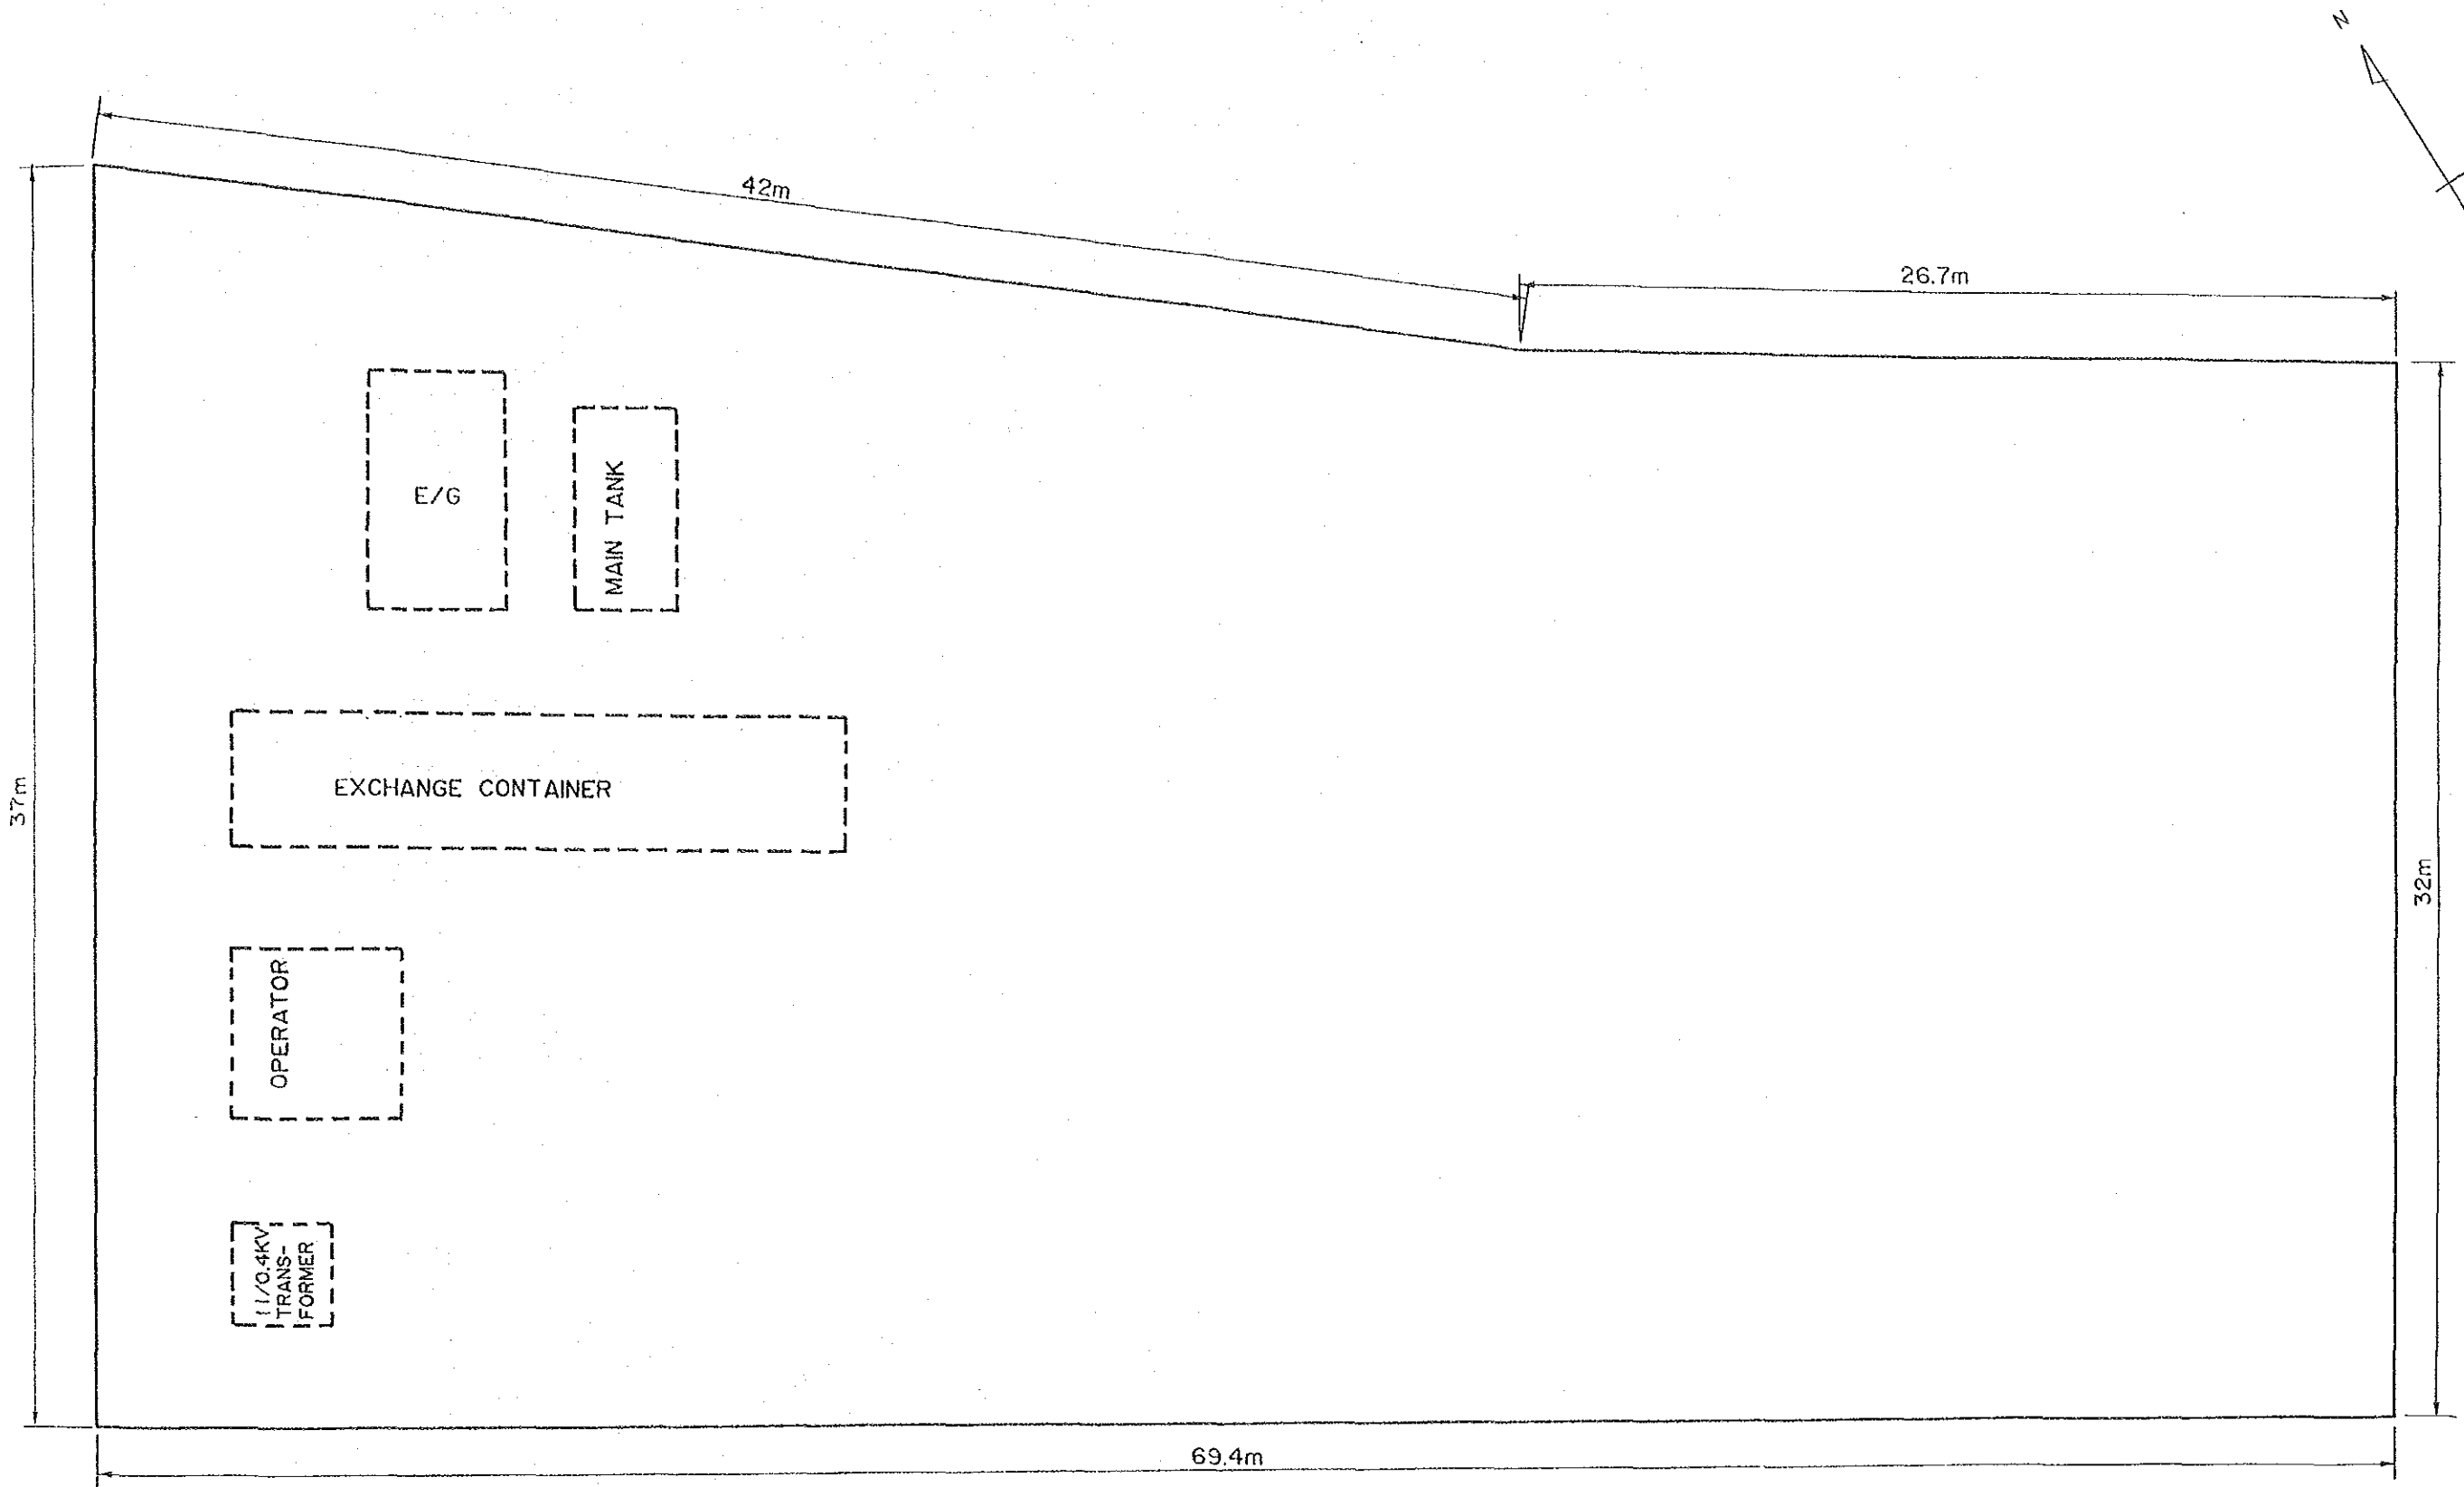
Site Layout Plan at Maubin New Exchange Office
